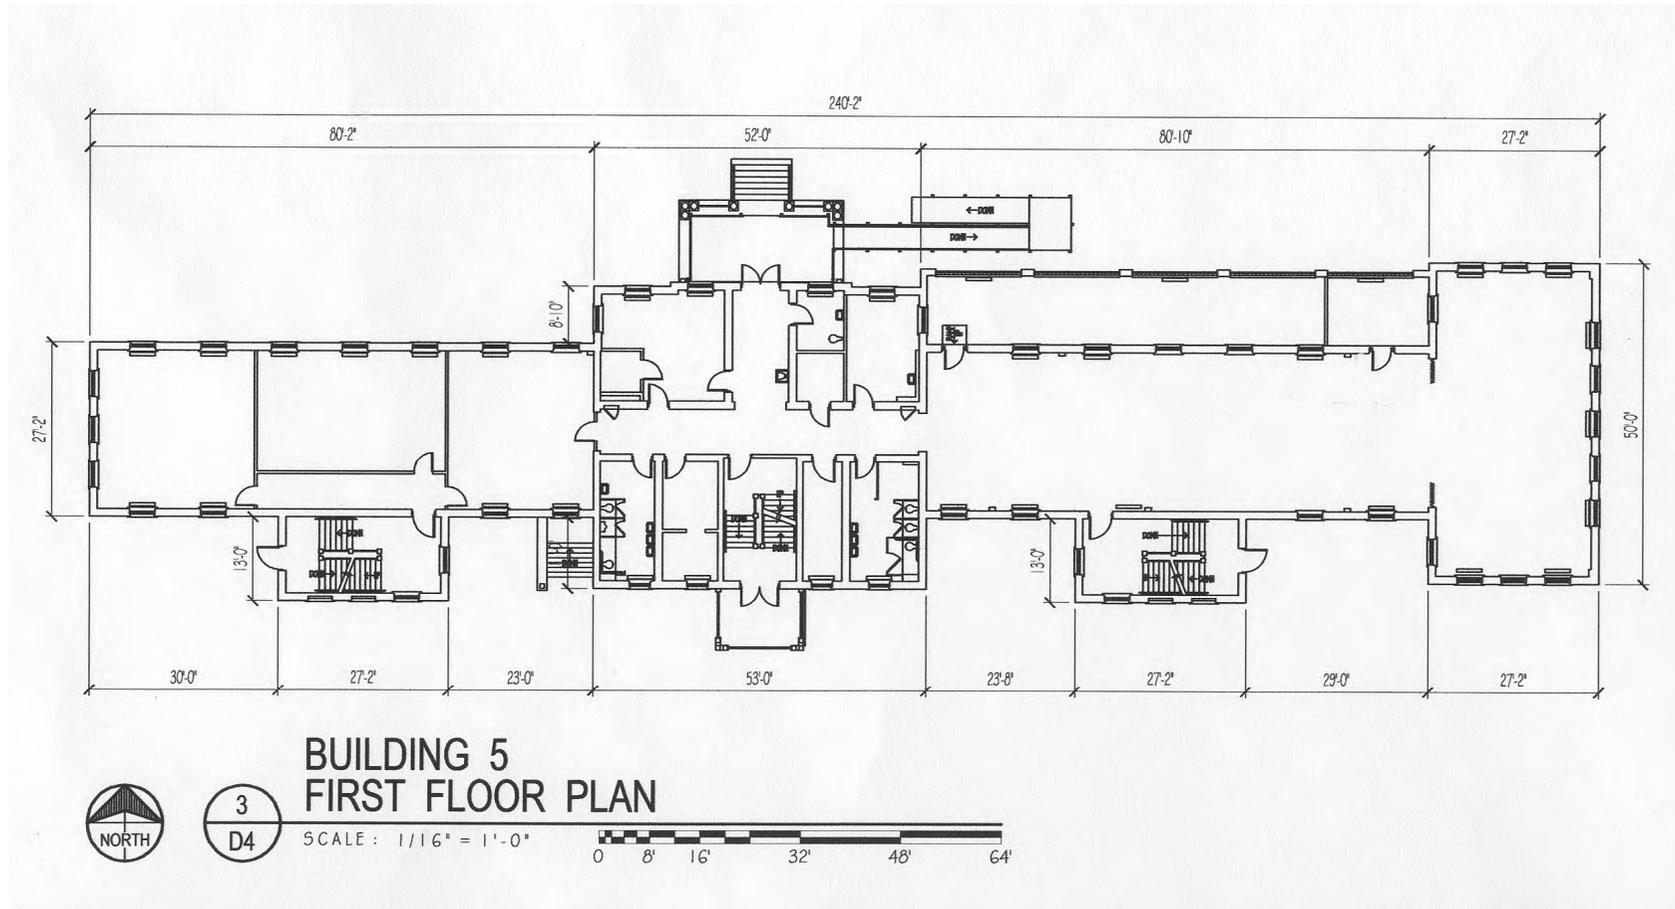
First floor plan of Building 5 showing existing conditions (Walton and Associates 2003).
